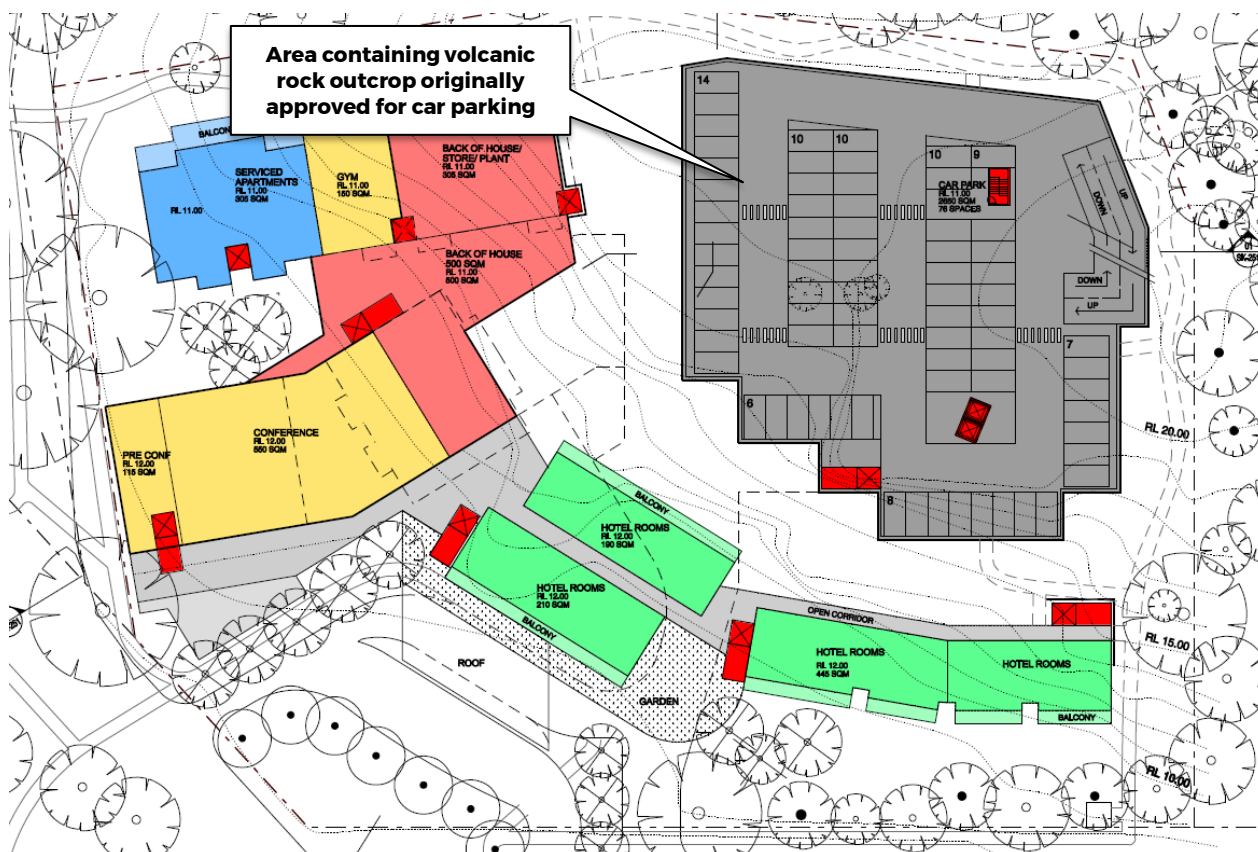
Approved Level 1 of Concept Plan No. MP06_0183
